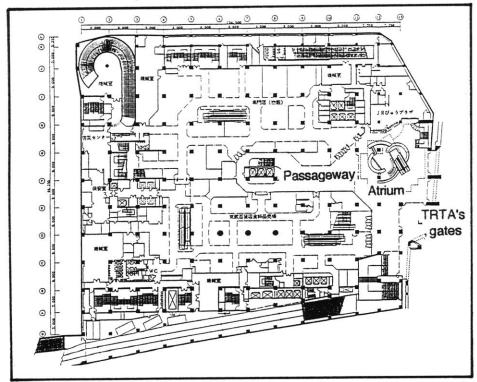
Plan of the First Basement Source: Ikebukuro Terminal Building Company, Report on the Ikebukuro Terminal Building, 1993.
